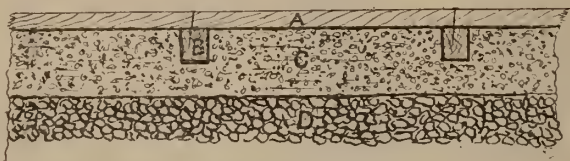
Concrete floor with boarded surface. A, floor boards; B, slips 2" \times 1½"; C, cement concrete 4" thick; D, rubble.
